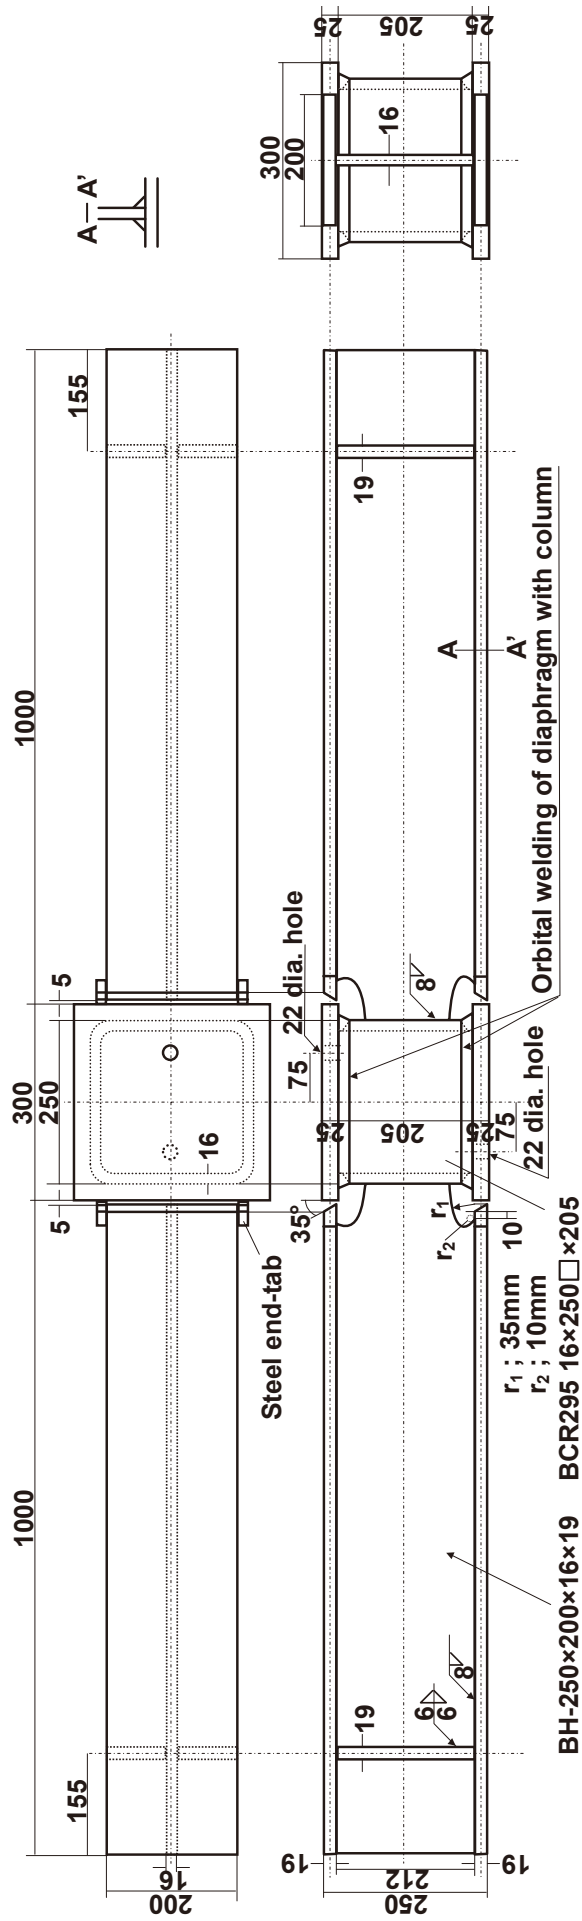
Schematic plan for the three point bending test of full-size beam-to-column assemblies
